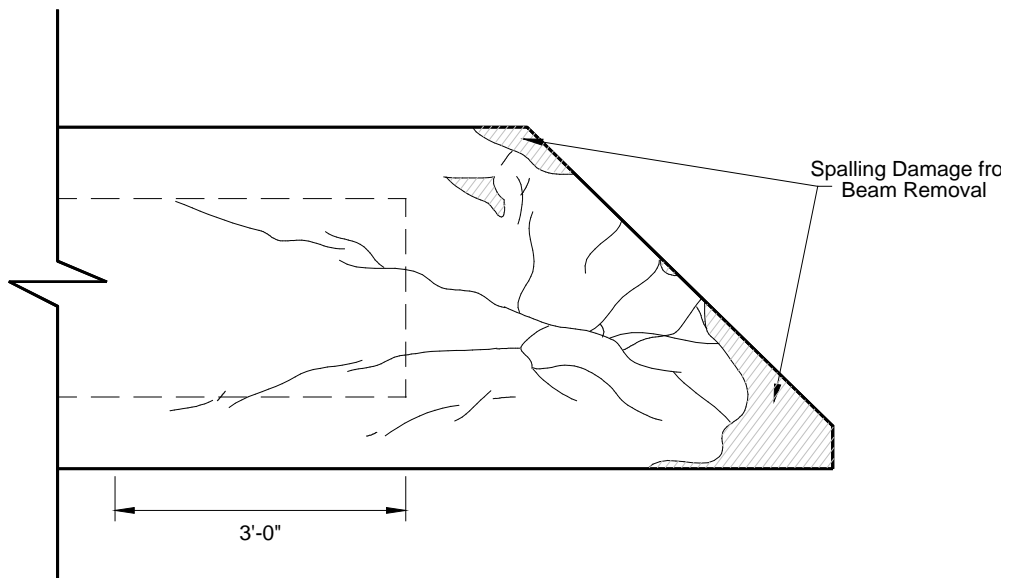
Cracking in Bottom Flange of Box Beam 5 - Untested End
